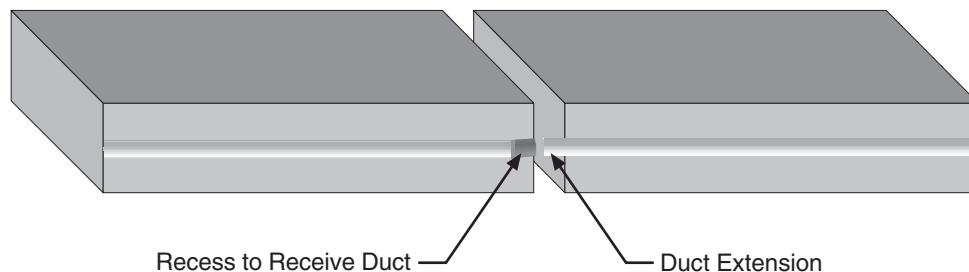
Keyed duct across a panel joint for a precast pavement
